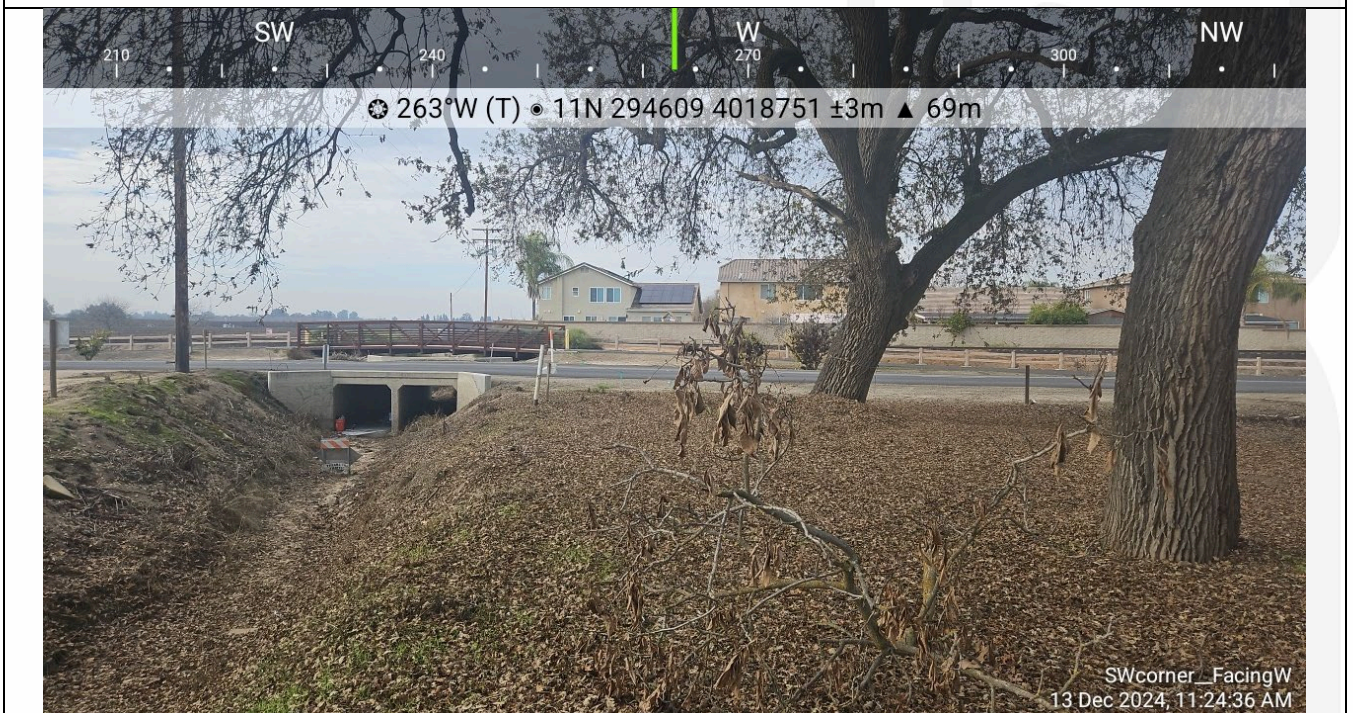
View of site conditions on the southwest corner of the project area facing west.
